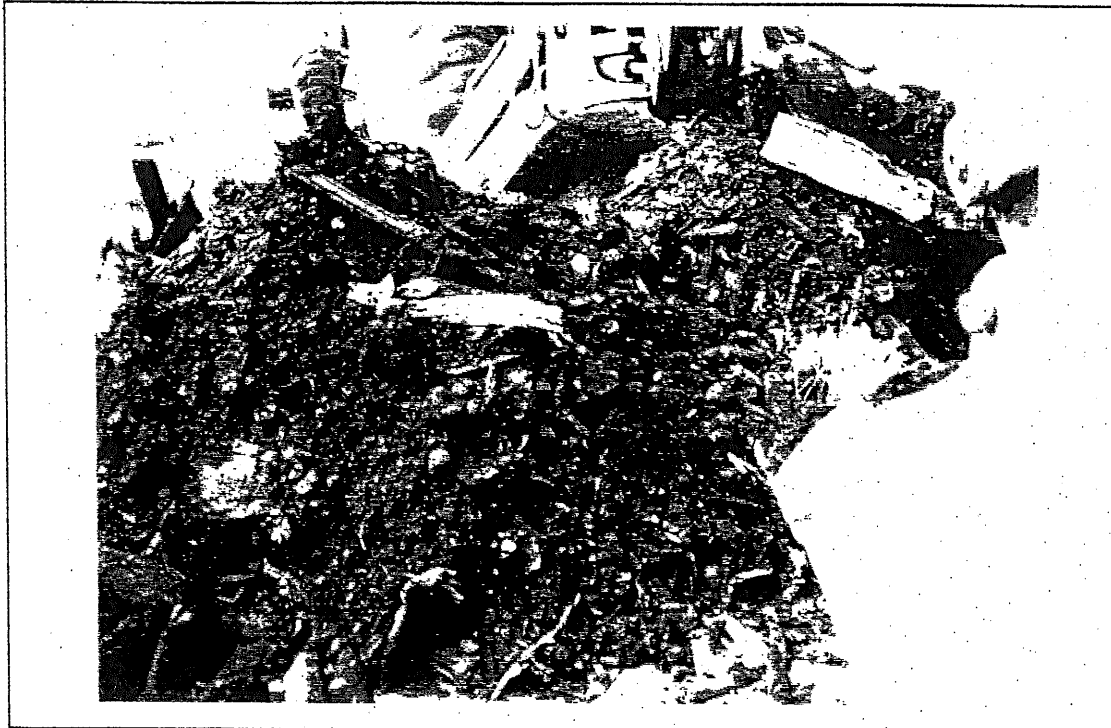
Test Pit 10 C & D material consisting of plastic, metal, and oily sand.
